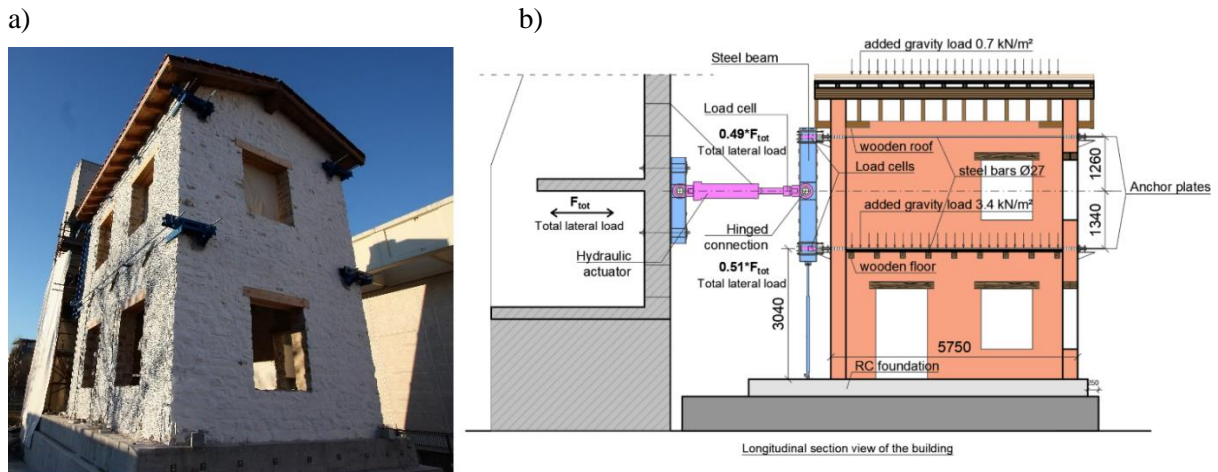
North-East view of the Pilot Building (a); Test setup (b)
